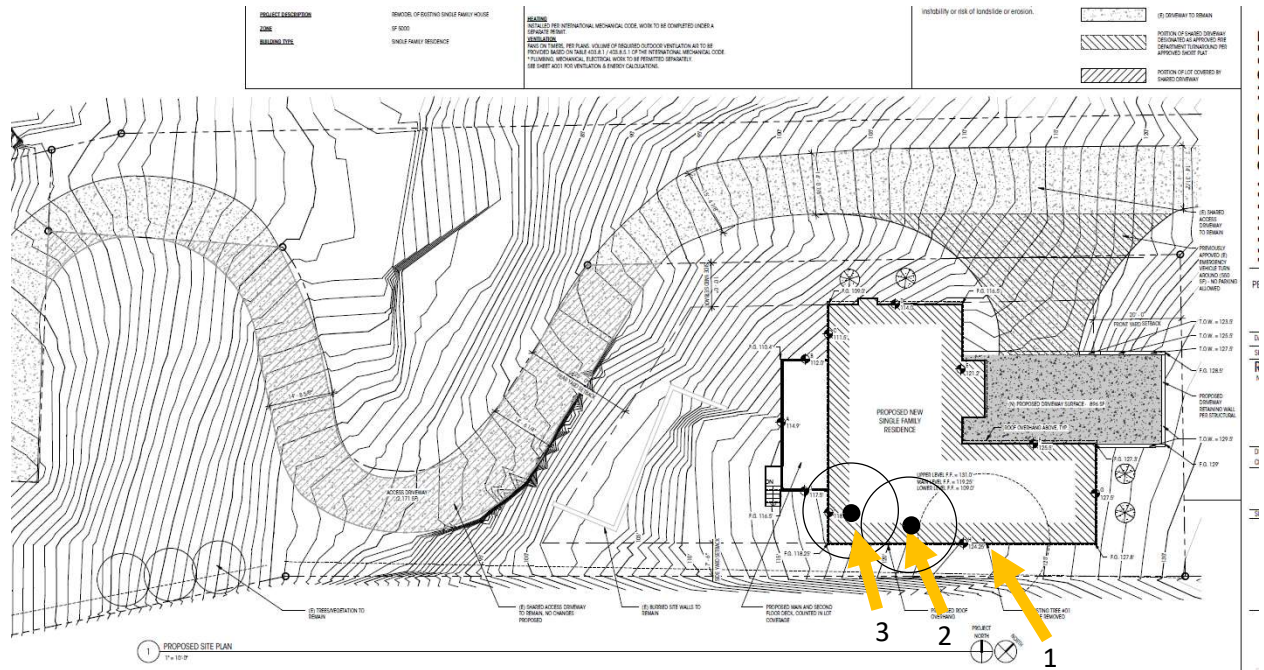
Site Plan: Kahn Spec Home (Brandt Design Group, 11/30/2020) with tree locations overlaid on the current development plans.
